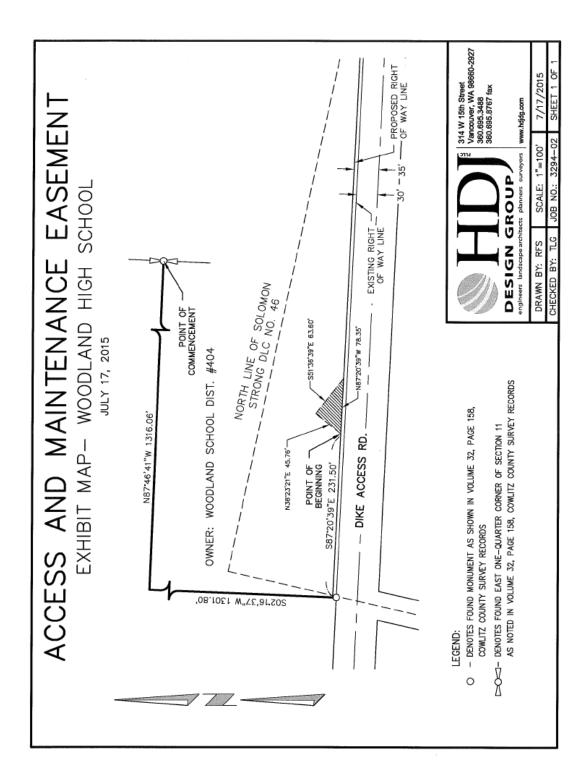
EXHIBIT B STORMWATER ACCESS AND MAINTENANCE EASEMENT NO. 2
